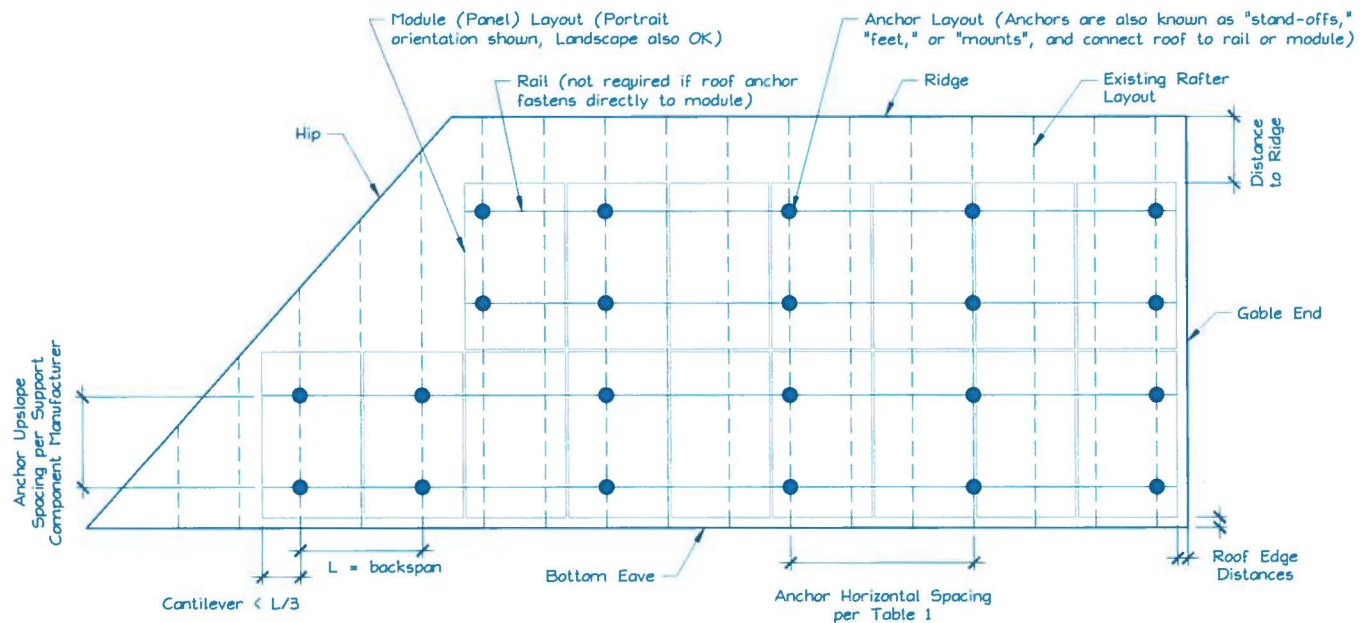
Sample Solar Panel Array and Anchor Layout Diagram (Roof Plan).
